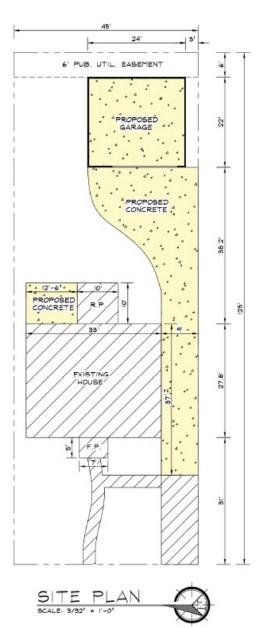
, by Applicant: proposed site plan showing garage, driveway and rear patio locations.
